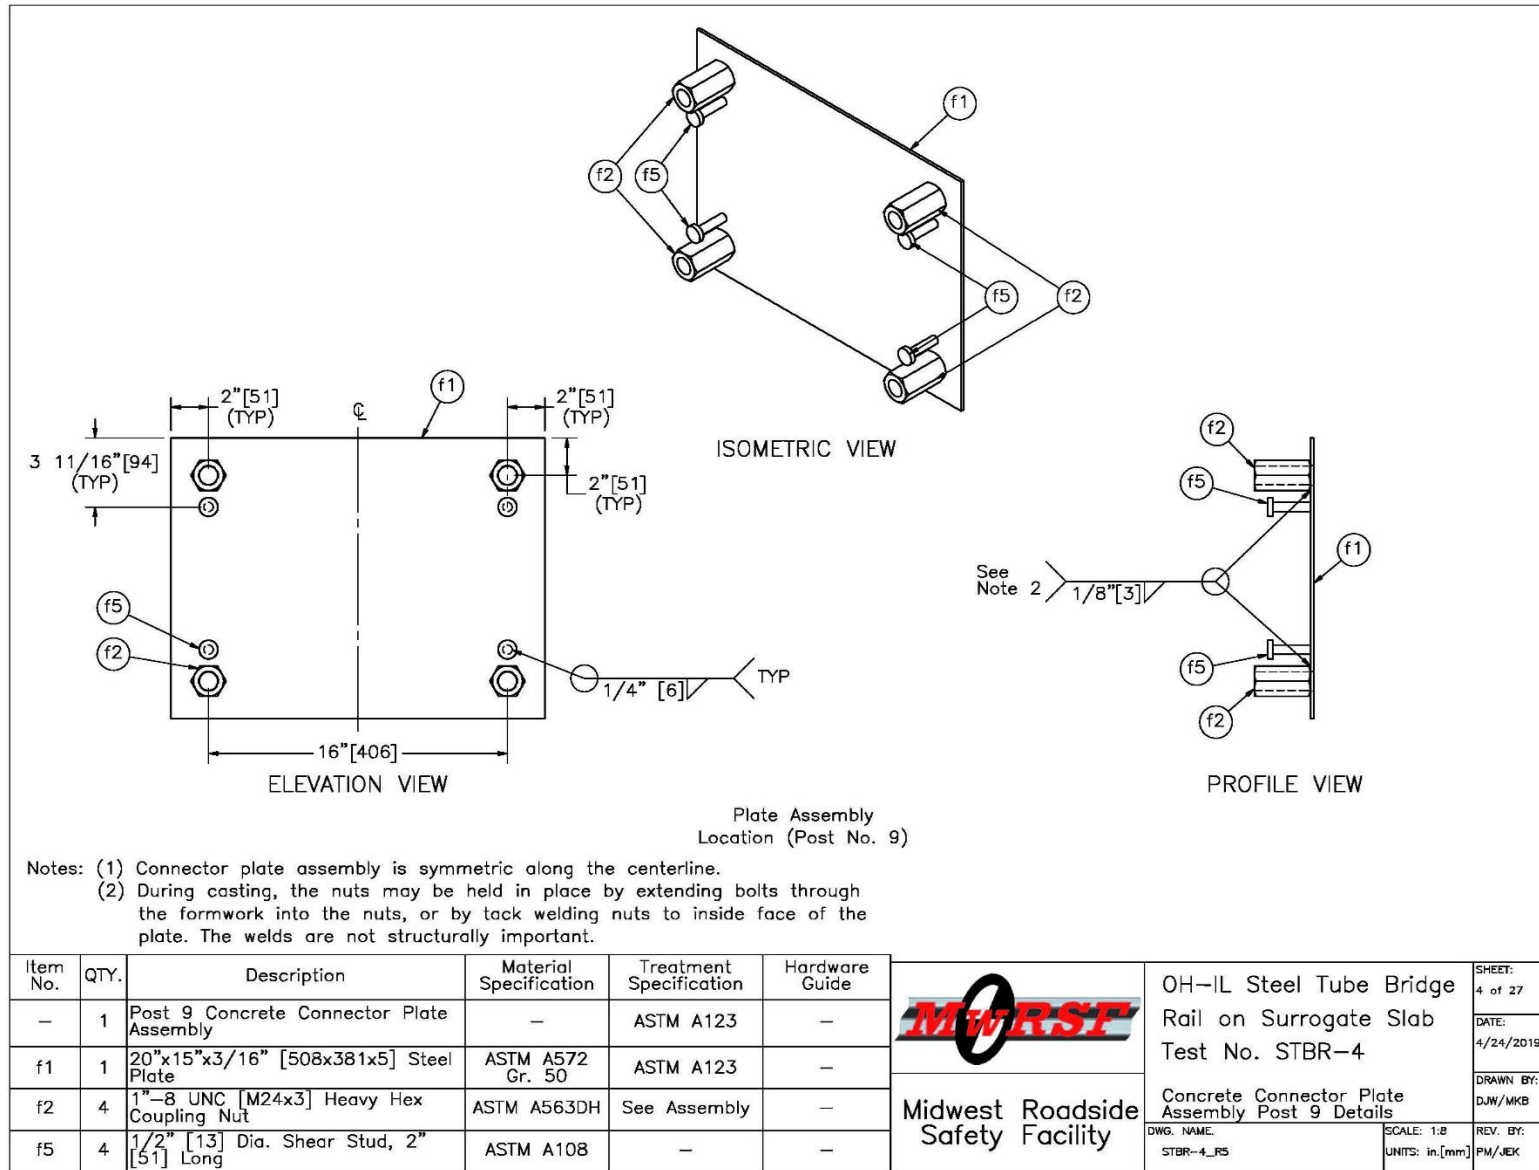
Concrete Connector Plate Assembly Details, Test No. STBR-4
